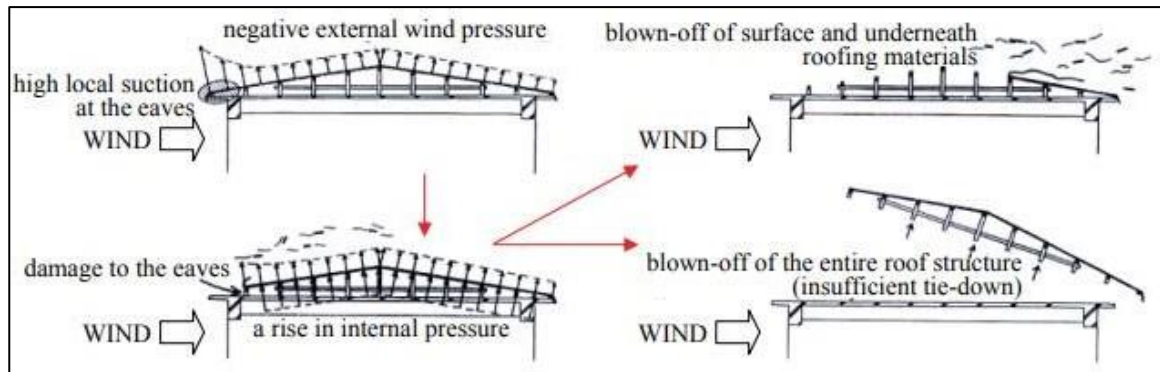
The behaviour of the roof when subjected to the wind loading (Tamura,2009)
